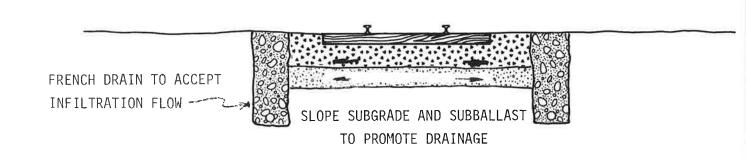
EXCAVATION BELOW GROUNDWATER LEVEL
